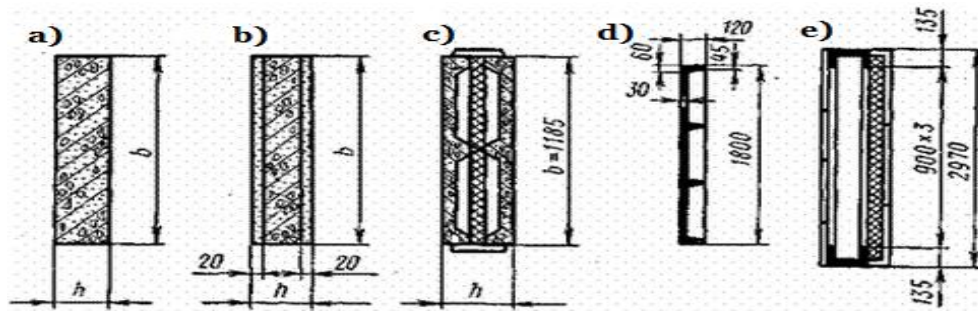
Wall panels: a - from cellular concrete; b - from lightweight concrete; c - from heavy concrete (three-layer); g - reinforced ribbed concrete for unheated buildings; d - metal with insulation [36].
